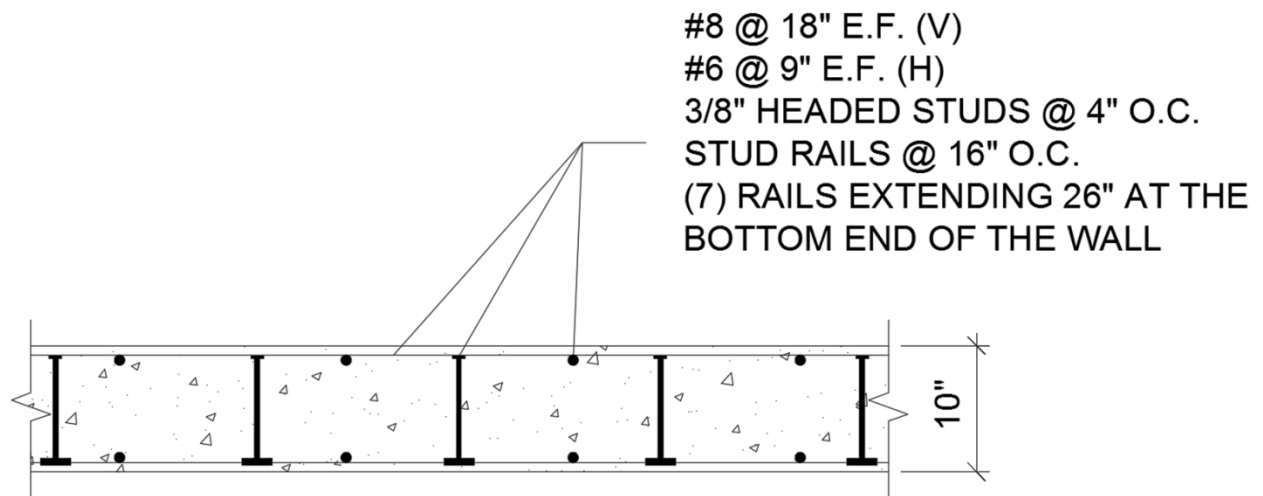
New exterior wall, cross-section at the 3rd floor level based on tsunami design requirements.
